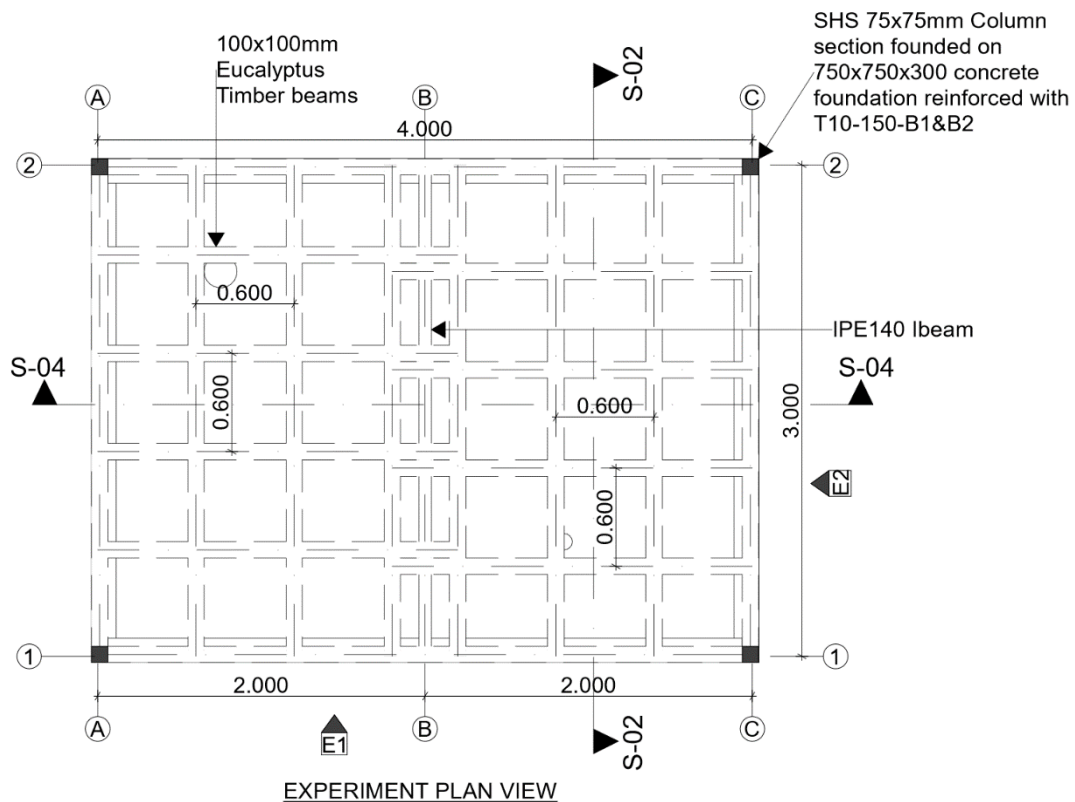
Hybrid (steel timber concrete) Slab model floor plan view
